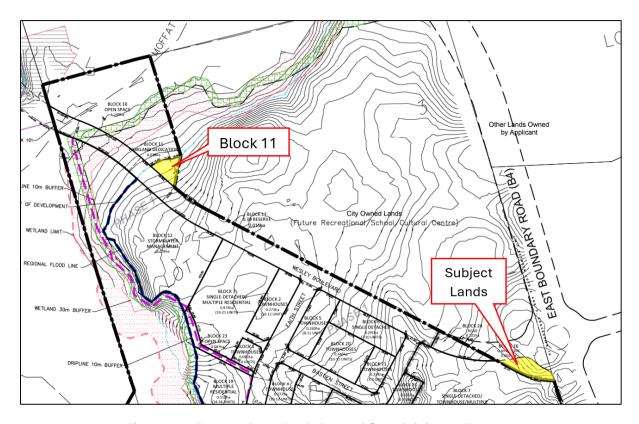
Excerpt from Draft Plan of Subdivision 30T-13103
